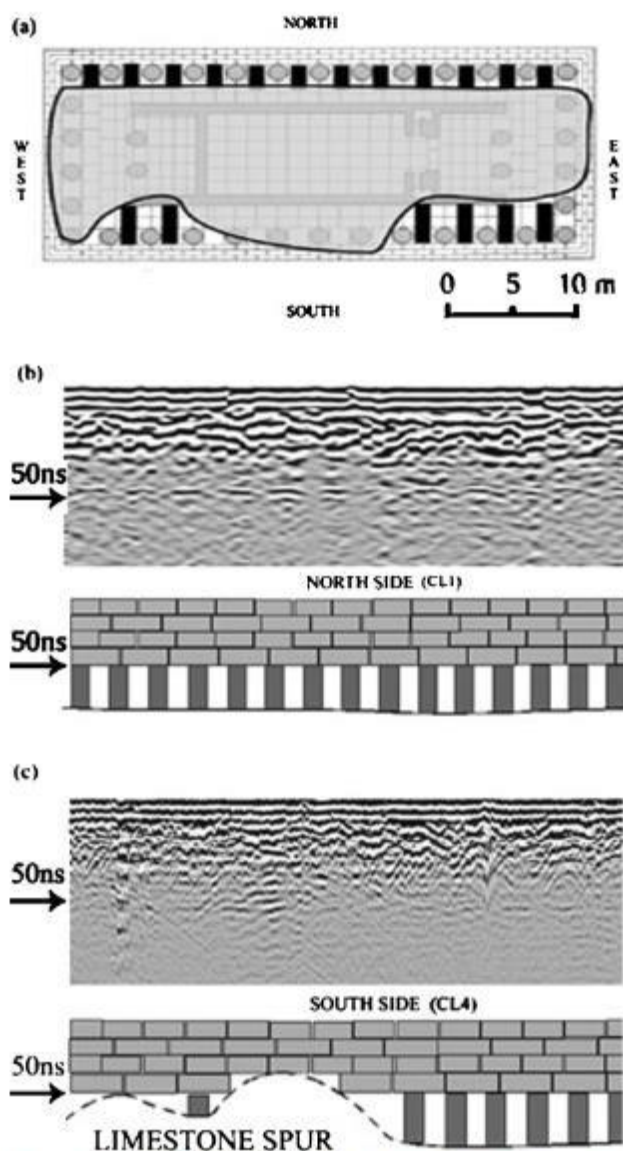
(a) Schematic reconstruction of the plan of the temple, (b) the northern longitudinal section and (c) the southern longitudinal section, based on the acquired GPR data. Note that the plan is constituted by two different units: the structural kerbs (black bars) and the limestone spur (light grey).
